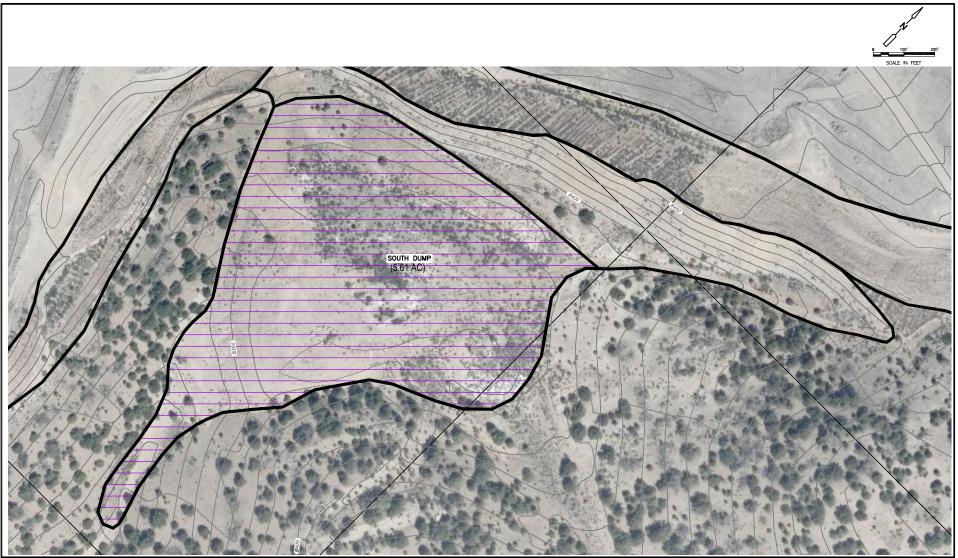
SOUTH DUMP ENLARGED SITE PLAN August 2018
